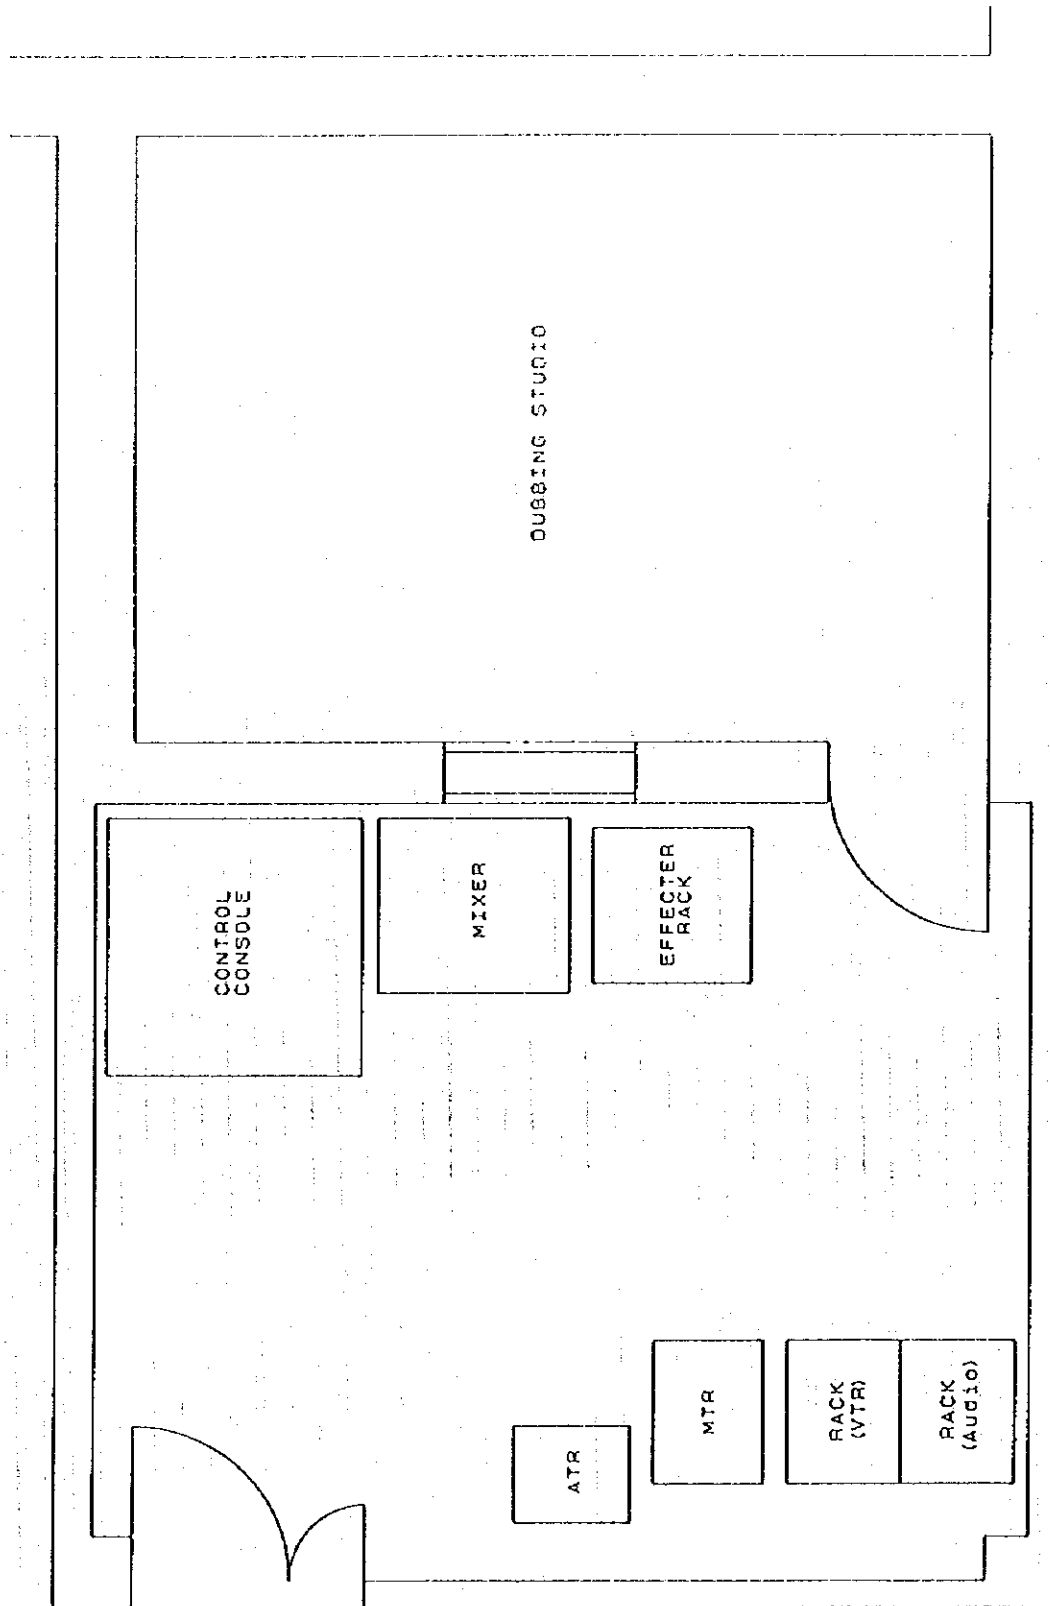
PHNOM PENH TV STATION, AUDIO DUBBING ROOM EQUIPMENT LAYOUT
